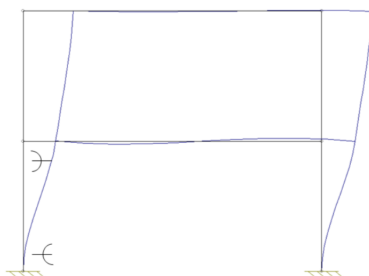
Deflection of the columns under an horizontal applied load [1]
